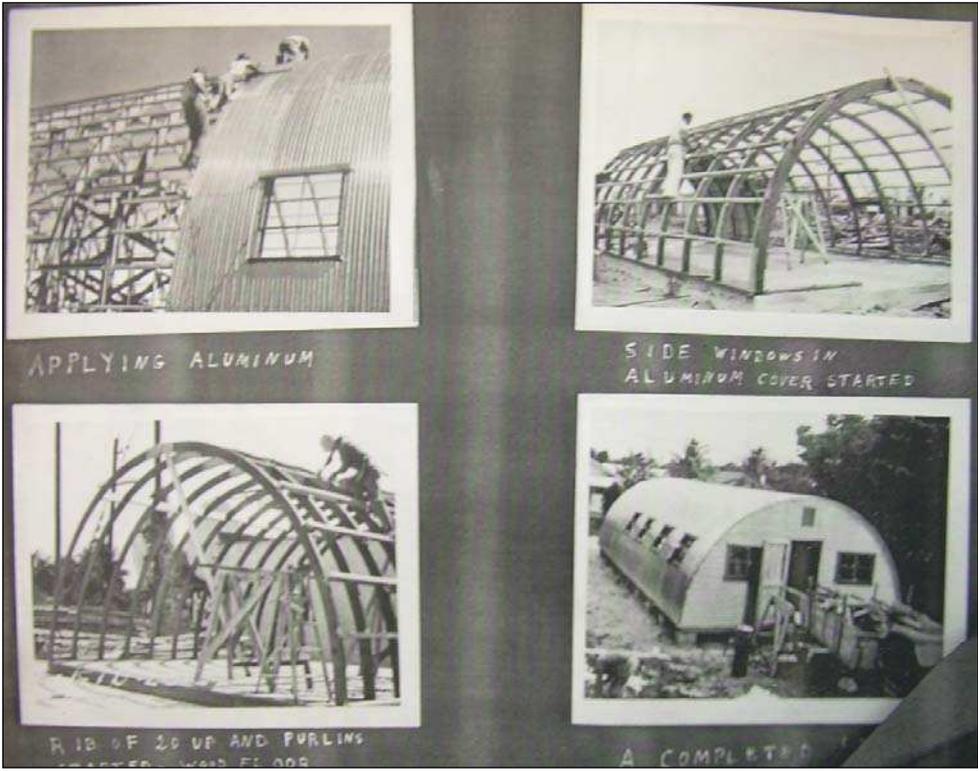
Photographs illustrating the Arc-Rib construction process (from Arc-Rib Buildings Inc. photograph albums/scrapbooks).
